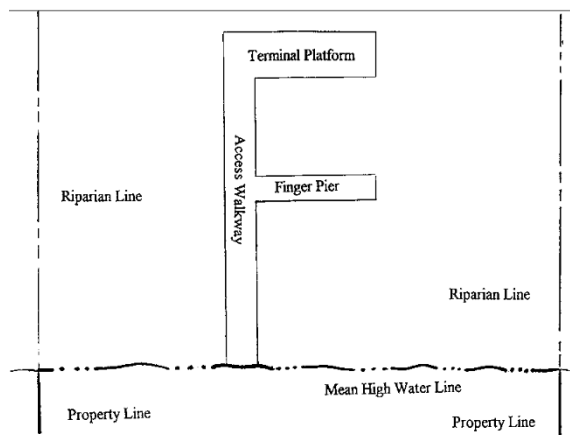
Private ~~Single-Family~~ Structure Plan View
